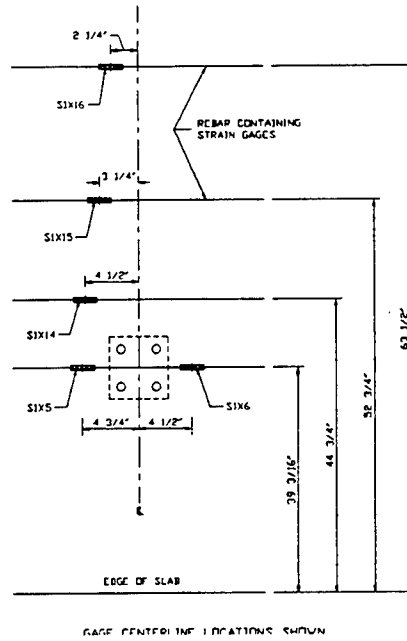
Slab Reinforcement Strain Gage Locations, Interior Column
